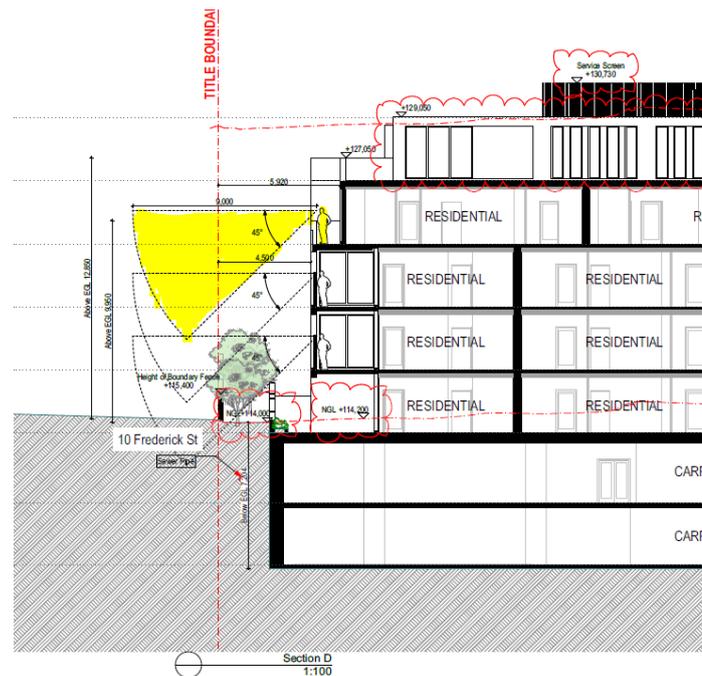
Downward views to the west from the balcony at third floor level do not have direct views to secluded private open space (note ground, first and second floor levels have been screened on the western elevation).
